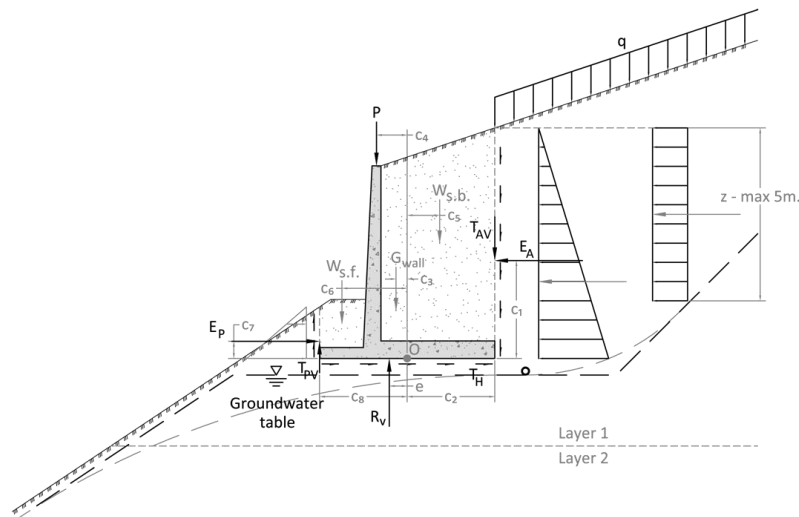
Forces acting on a general case of a cantilever retaining wall.
